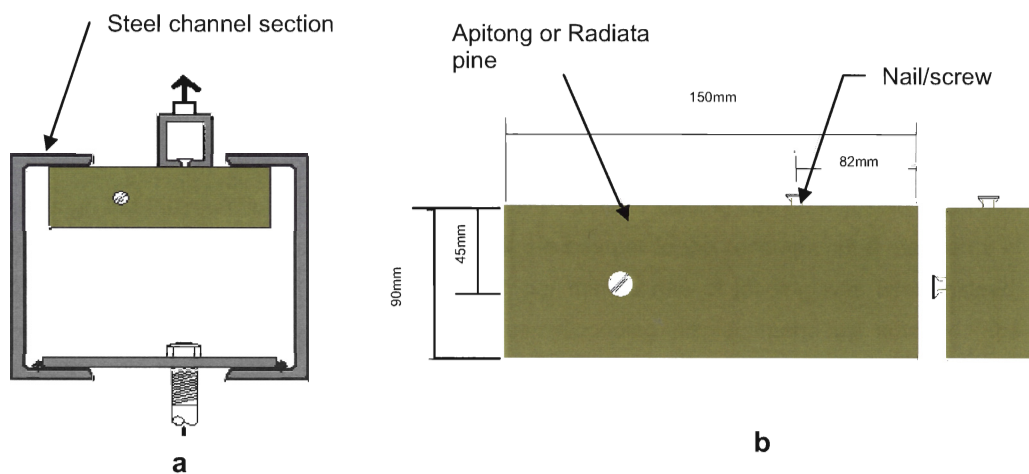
a. Assembly for screw withdrawal test and b. Dimension of the timber and location of the screw.
